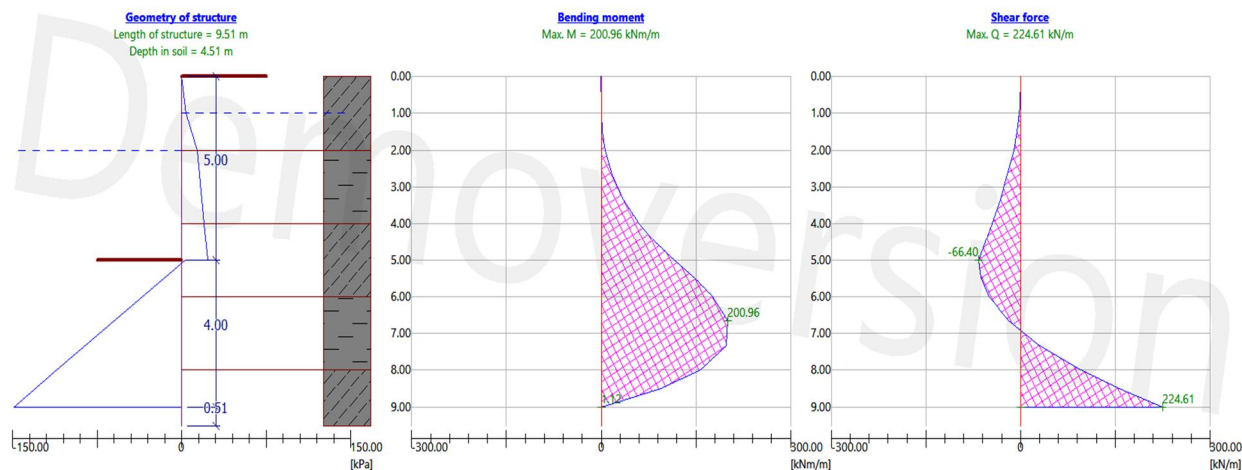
Model 5: U-section sheet pile wall for 5m depth of ditch in 2 layer soil
